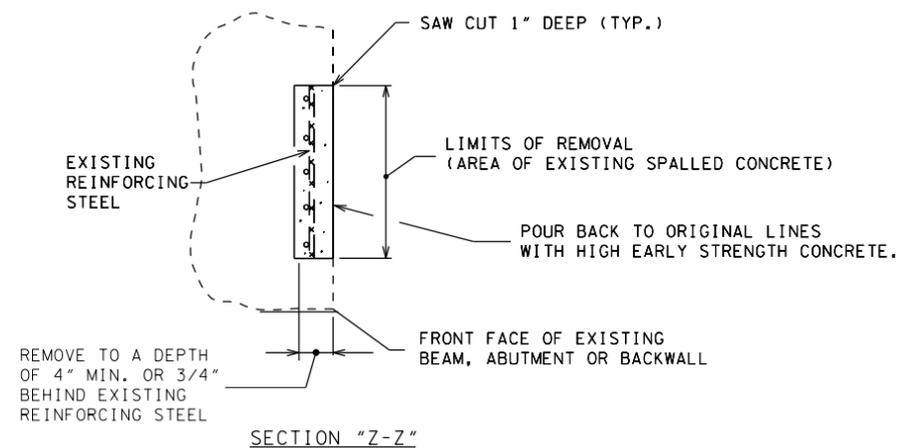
DETAILS OF SPALLED CONCRETE SURFACE AND REPAIR
